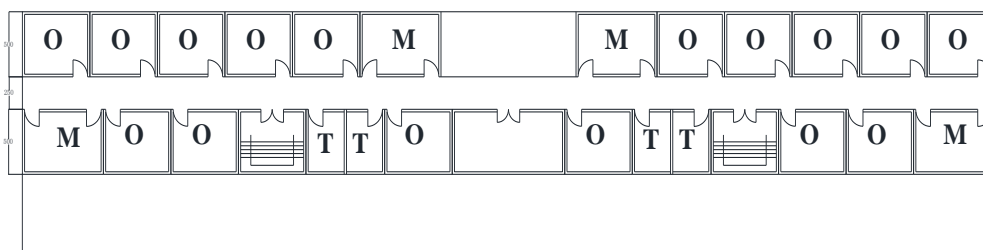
Office building layout (O-office, M-meeting, T-toilet).
